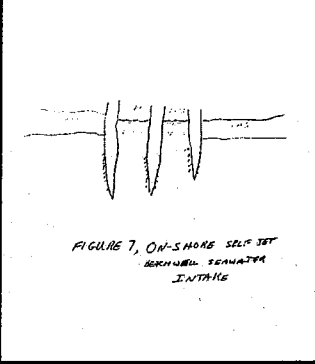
, ON-SHORE SELF JET BERM WALL SEAWATER INTAKE
